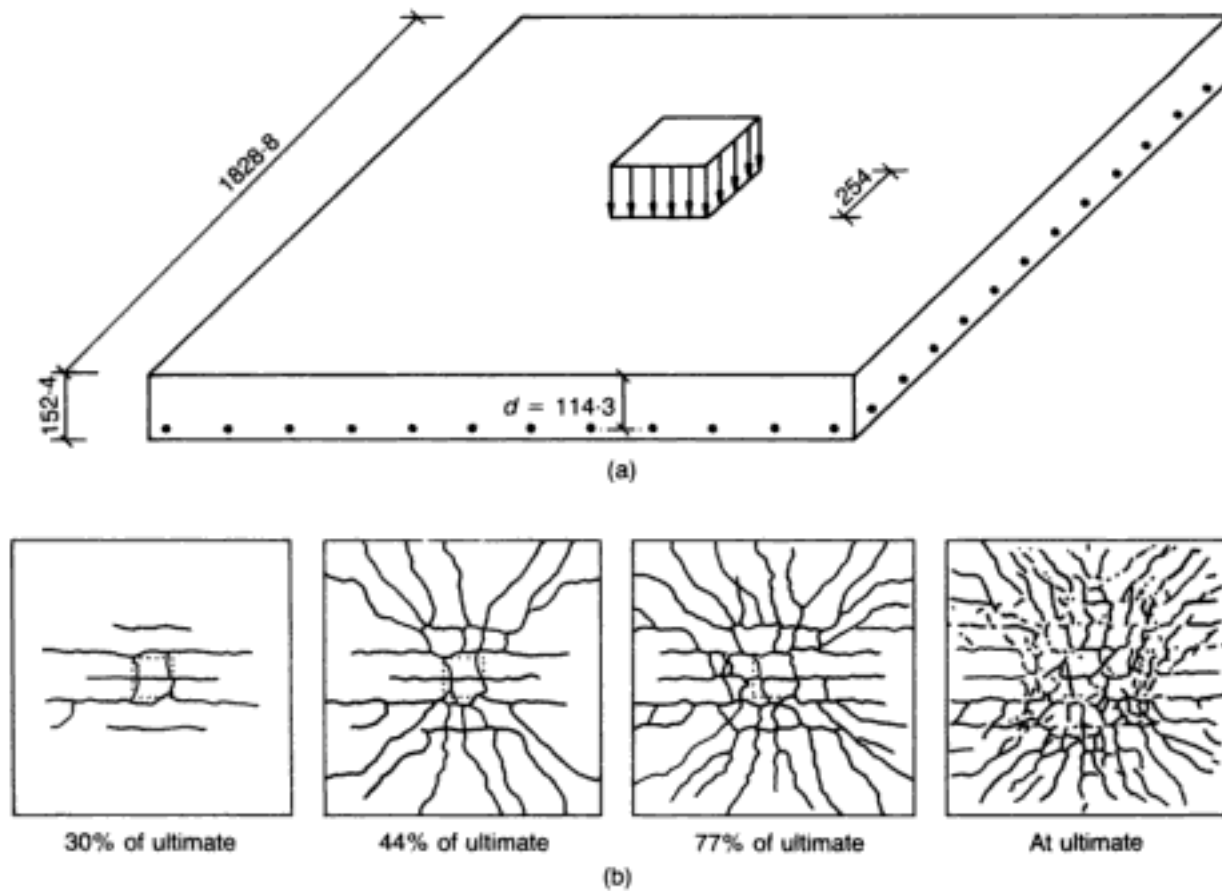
RC slab exhibiting punching failure (CS8). Experimental data:^{56,139} (a) dimensions and detailing of reinforcement (all dimensions in mm); (b) crack patterns on the tensile face at various load stages
